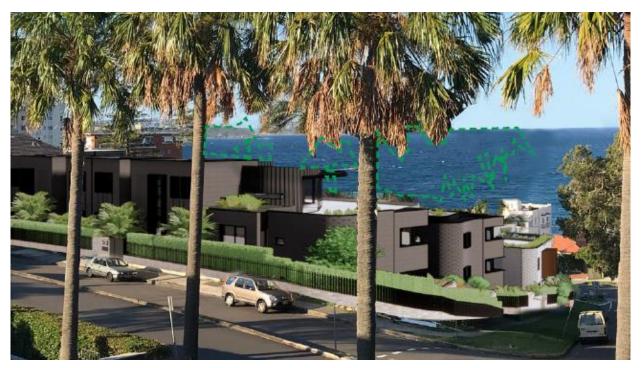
Proposed View Apt 7/7 College Street, Level 2 Balcony View (Source: Squillace Architects)
